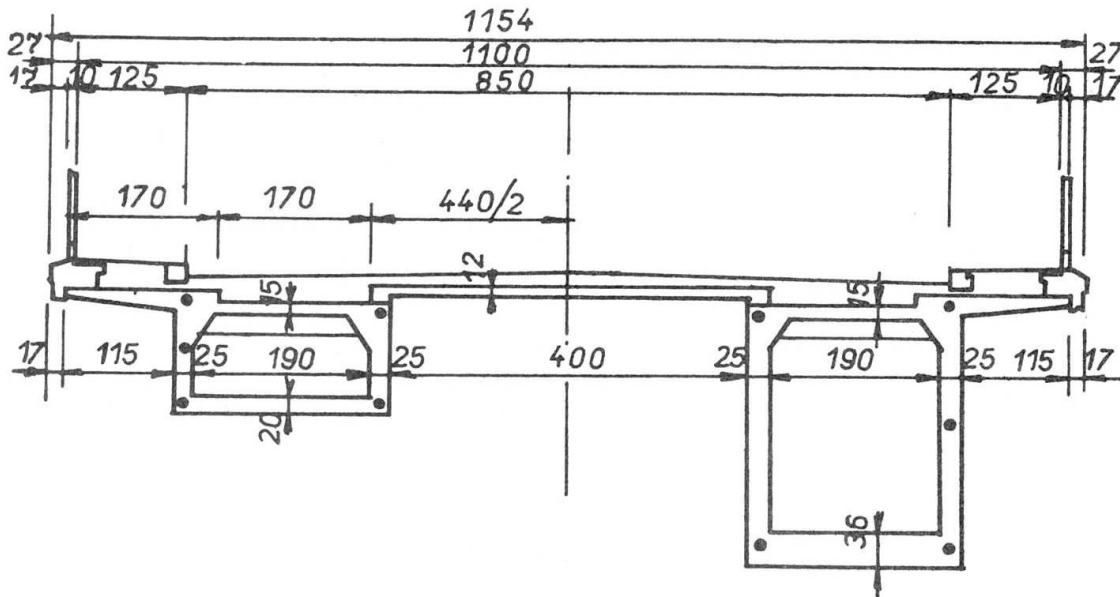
The cross section of the cantilever highway bridge with prestressed precast concrete elements.
